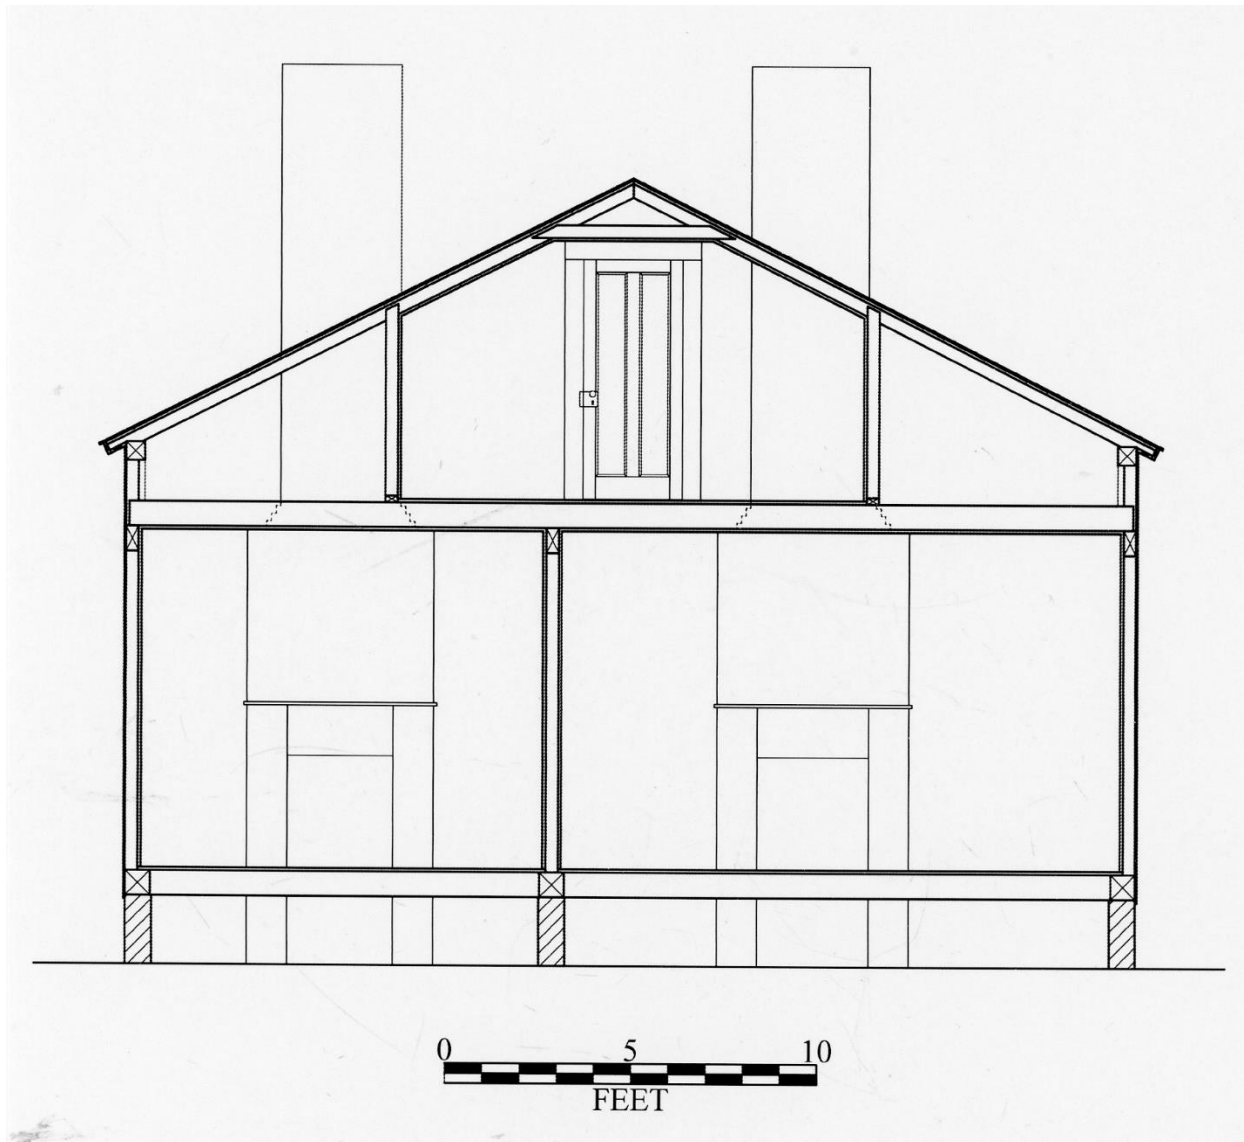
Conjectural sectional view of House D, looking north through the southern half of the house. Given its 1840s-era construction, the house is believed to have been timber frame. Framing details, though speculative, are representative of contemporary housing in Springfield and Illinois.
